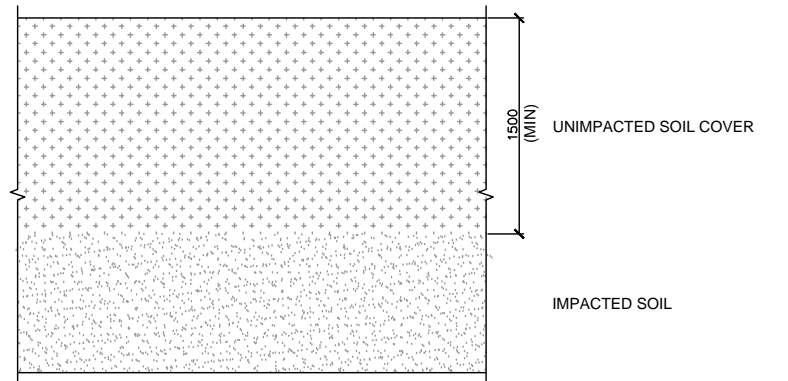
A SOFT CAP CONSTRUCTION - SERSON CREEK CORRIDOR (CHANNEL ONLY) NTS
